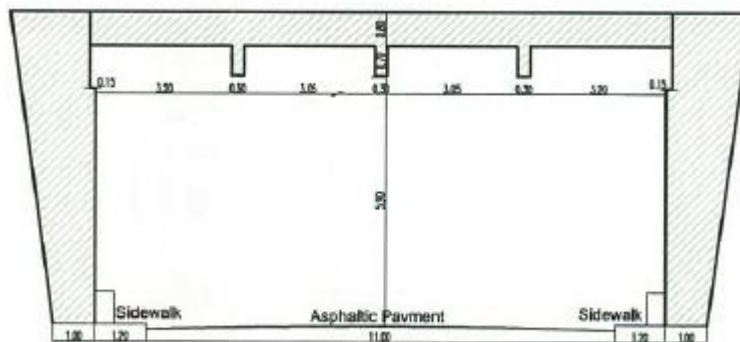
Dimensions of secondary beams, cross section (3-3)
